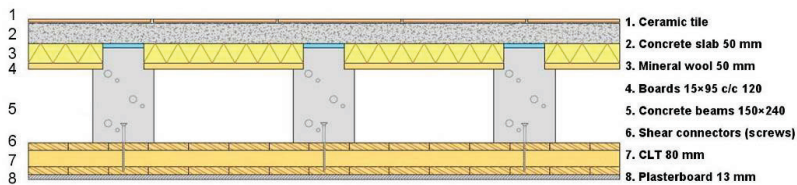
Early conceptual floor element configuration of a composite floor with CLT and concrete beams (semi-prefabricated structure with beams casted on CLT) – floating floor structurally disconnected form the ribbed floor structure
